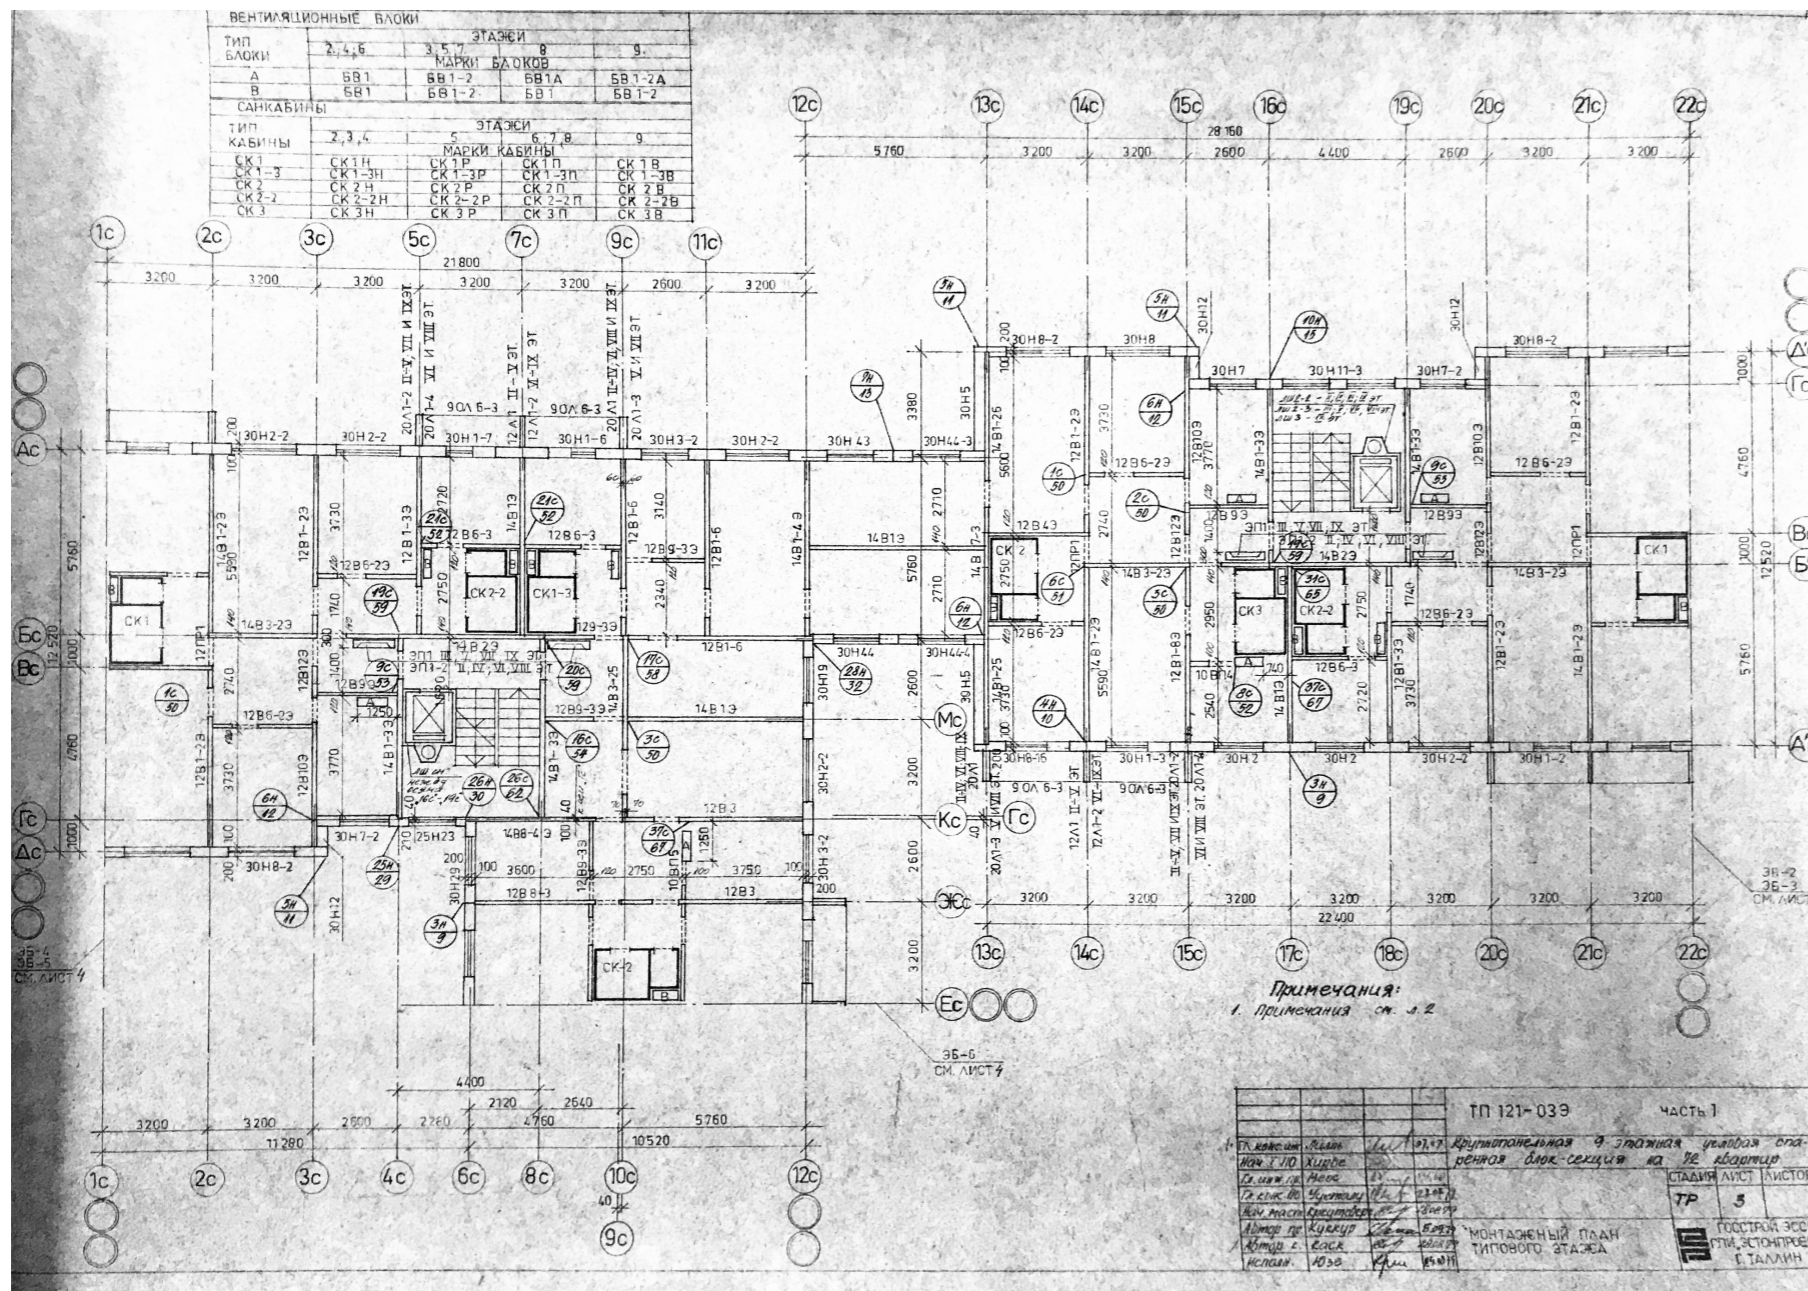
Standard floor plan of 9-storey prefabricated building in Lasnamäe
